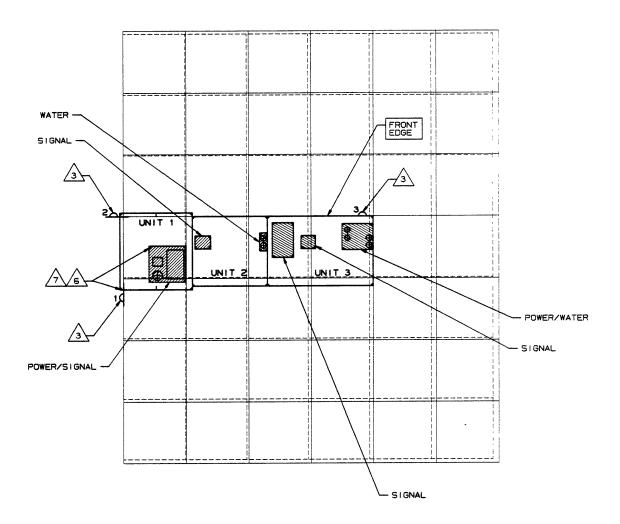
Placing Template 22121091 for Units 1 Through 3
